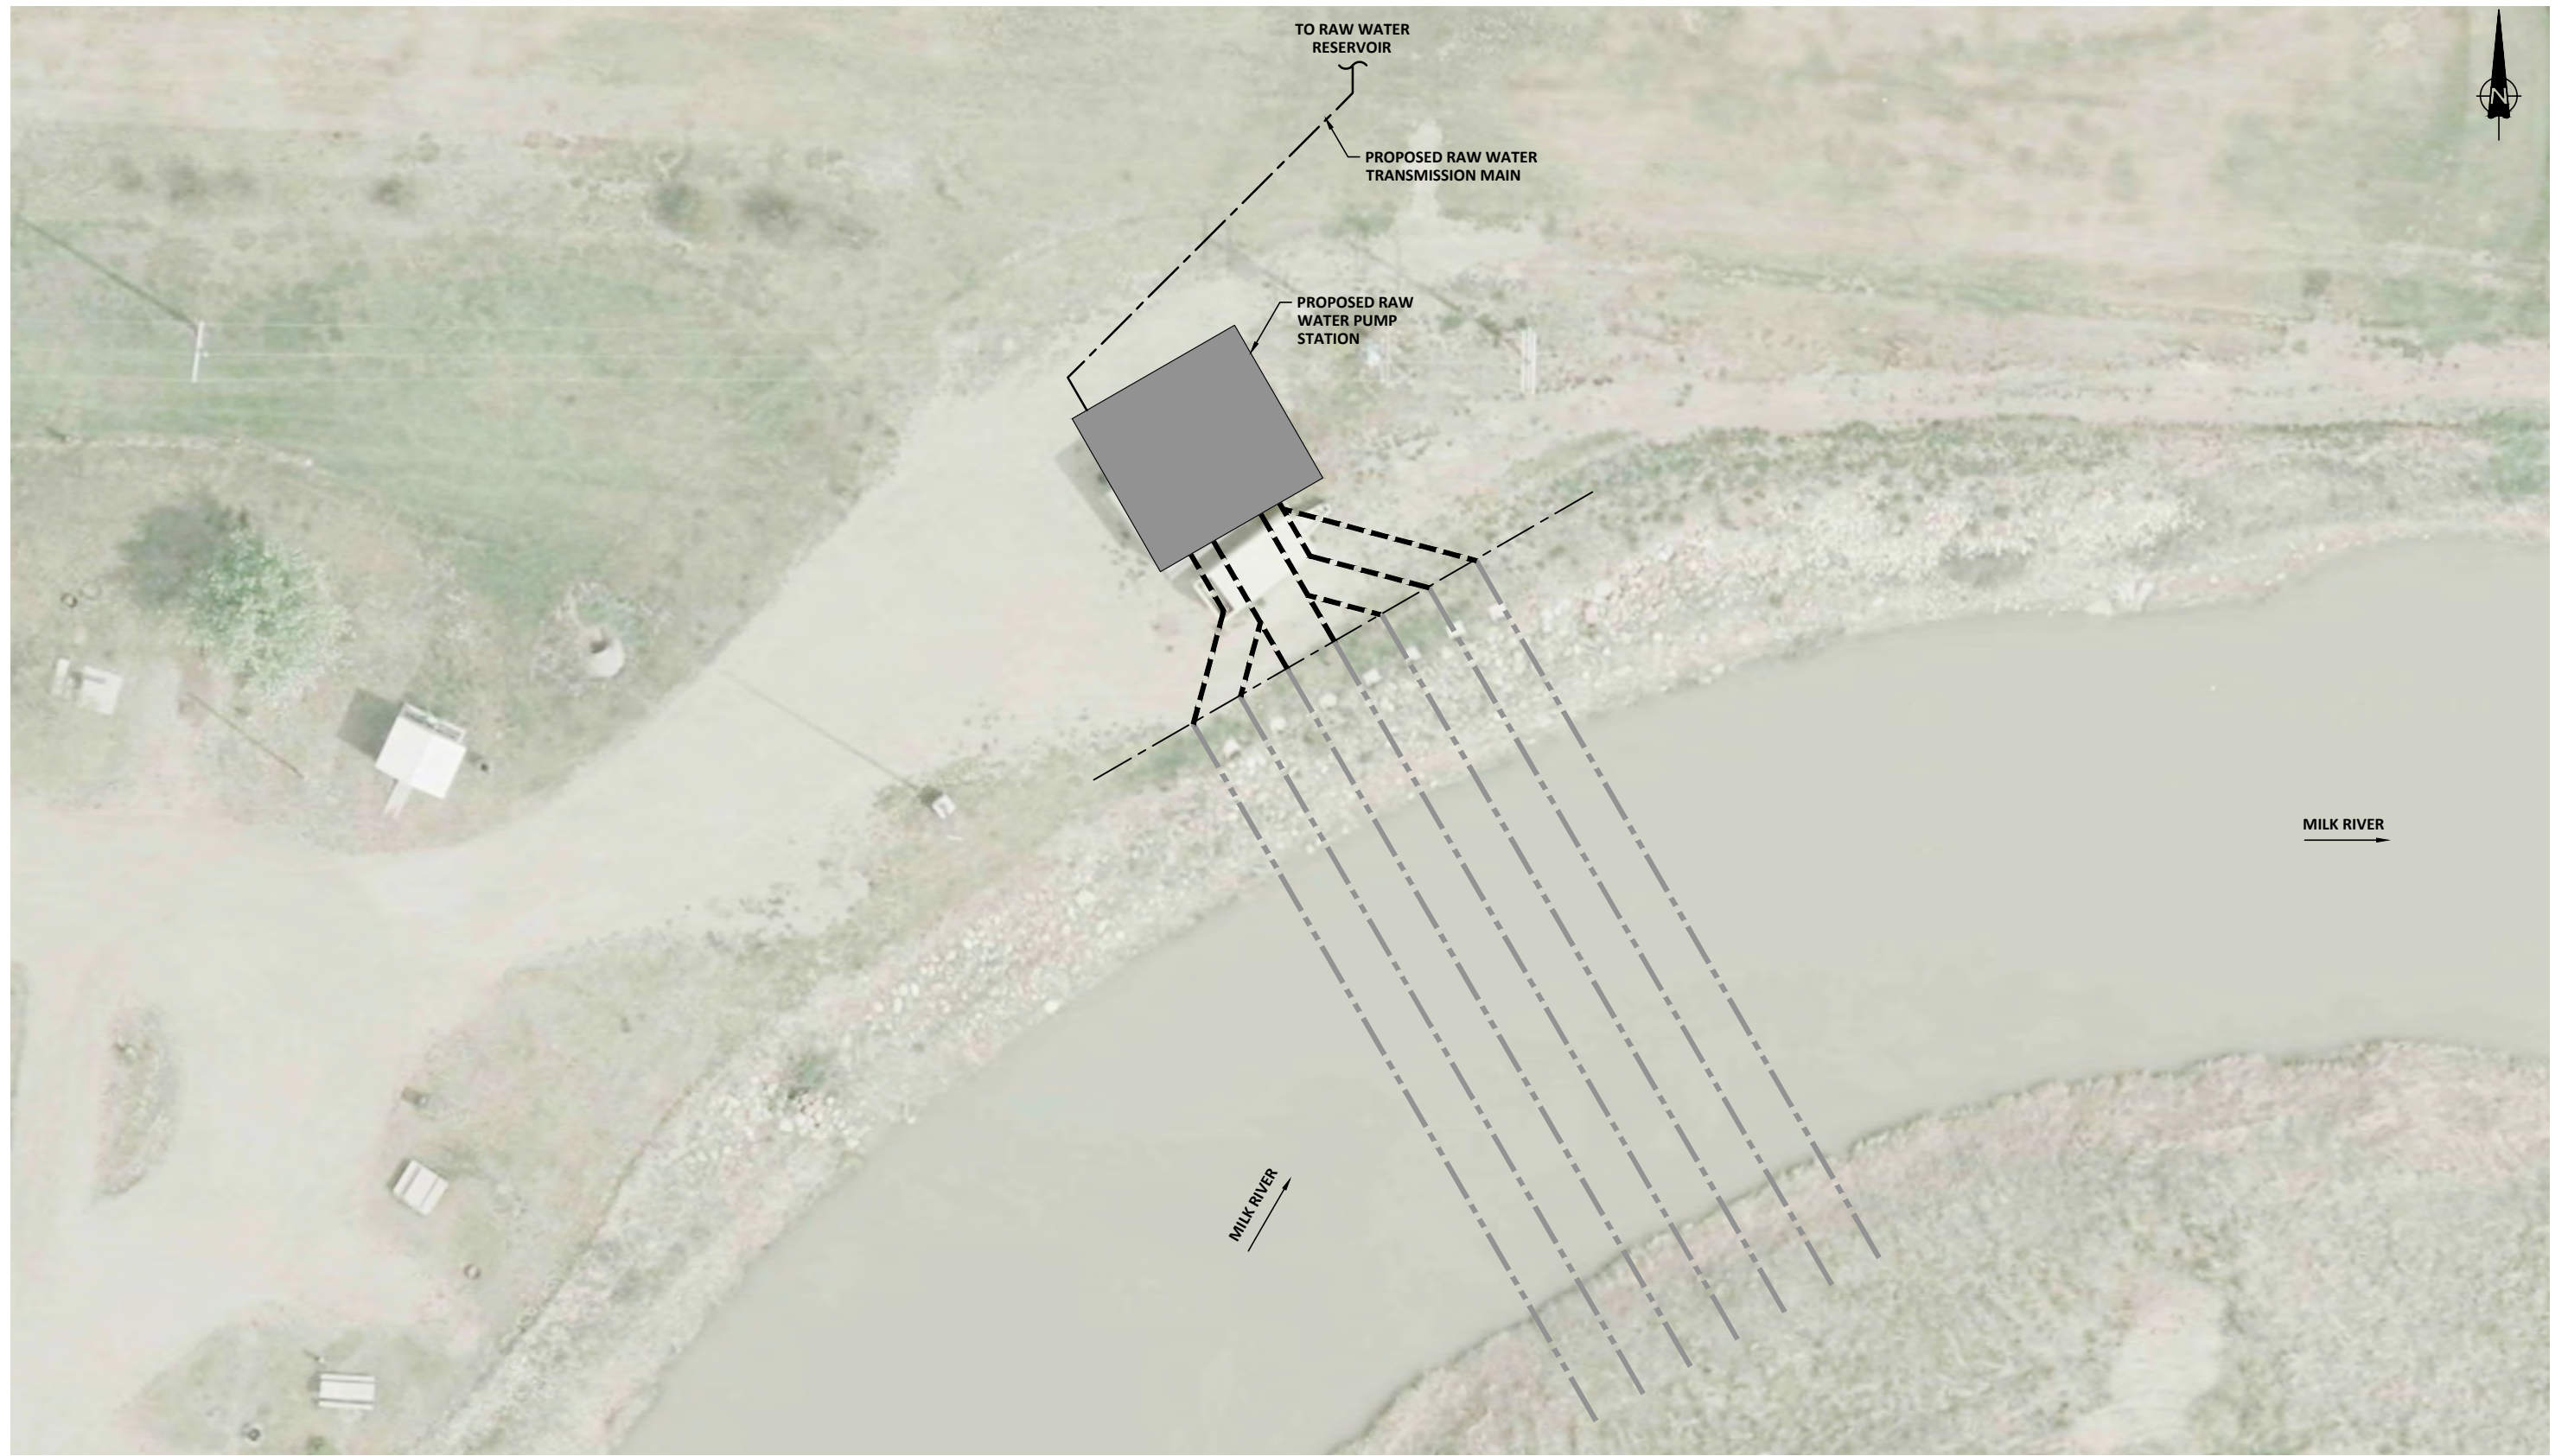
provides a conceptual alignment of the proposed raw water transmission system.
